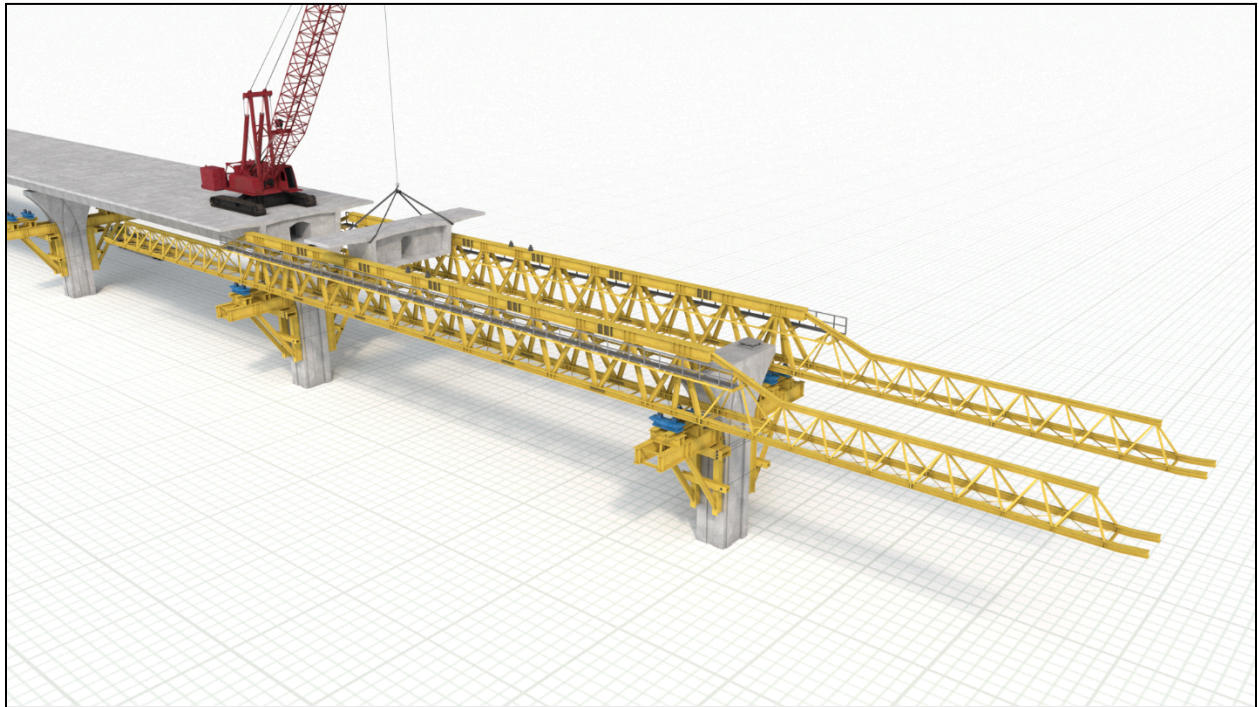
Span-by-Span Erection on Underslung Trusses Using a Crane or Derrick / Lifter on Deck
